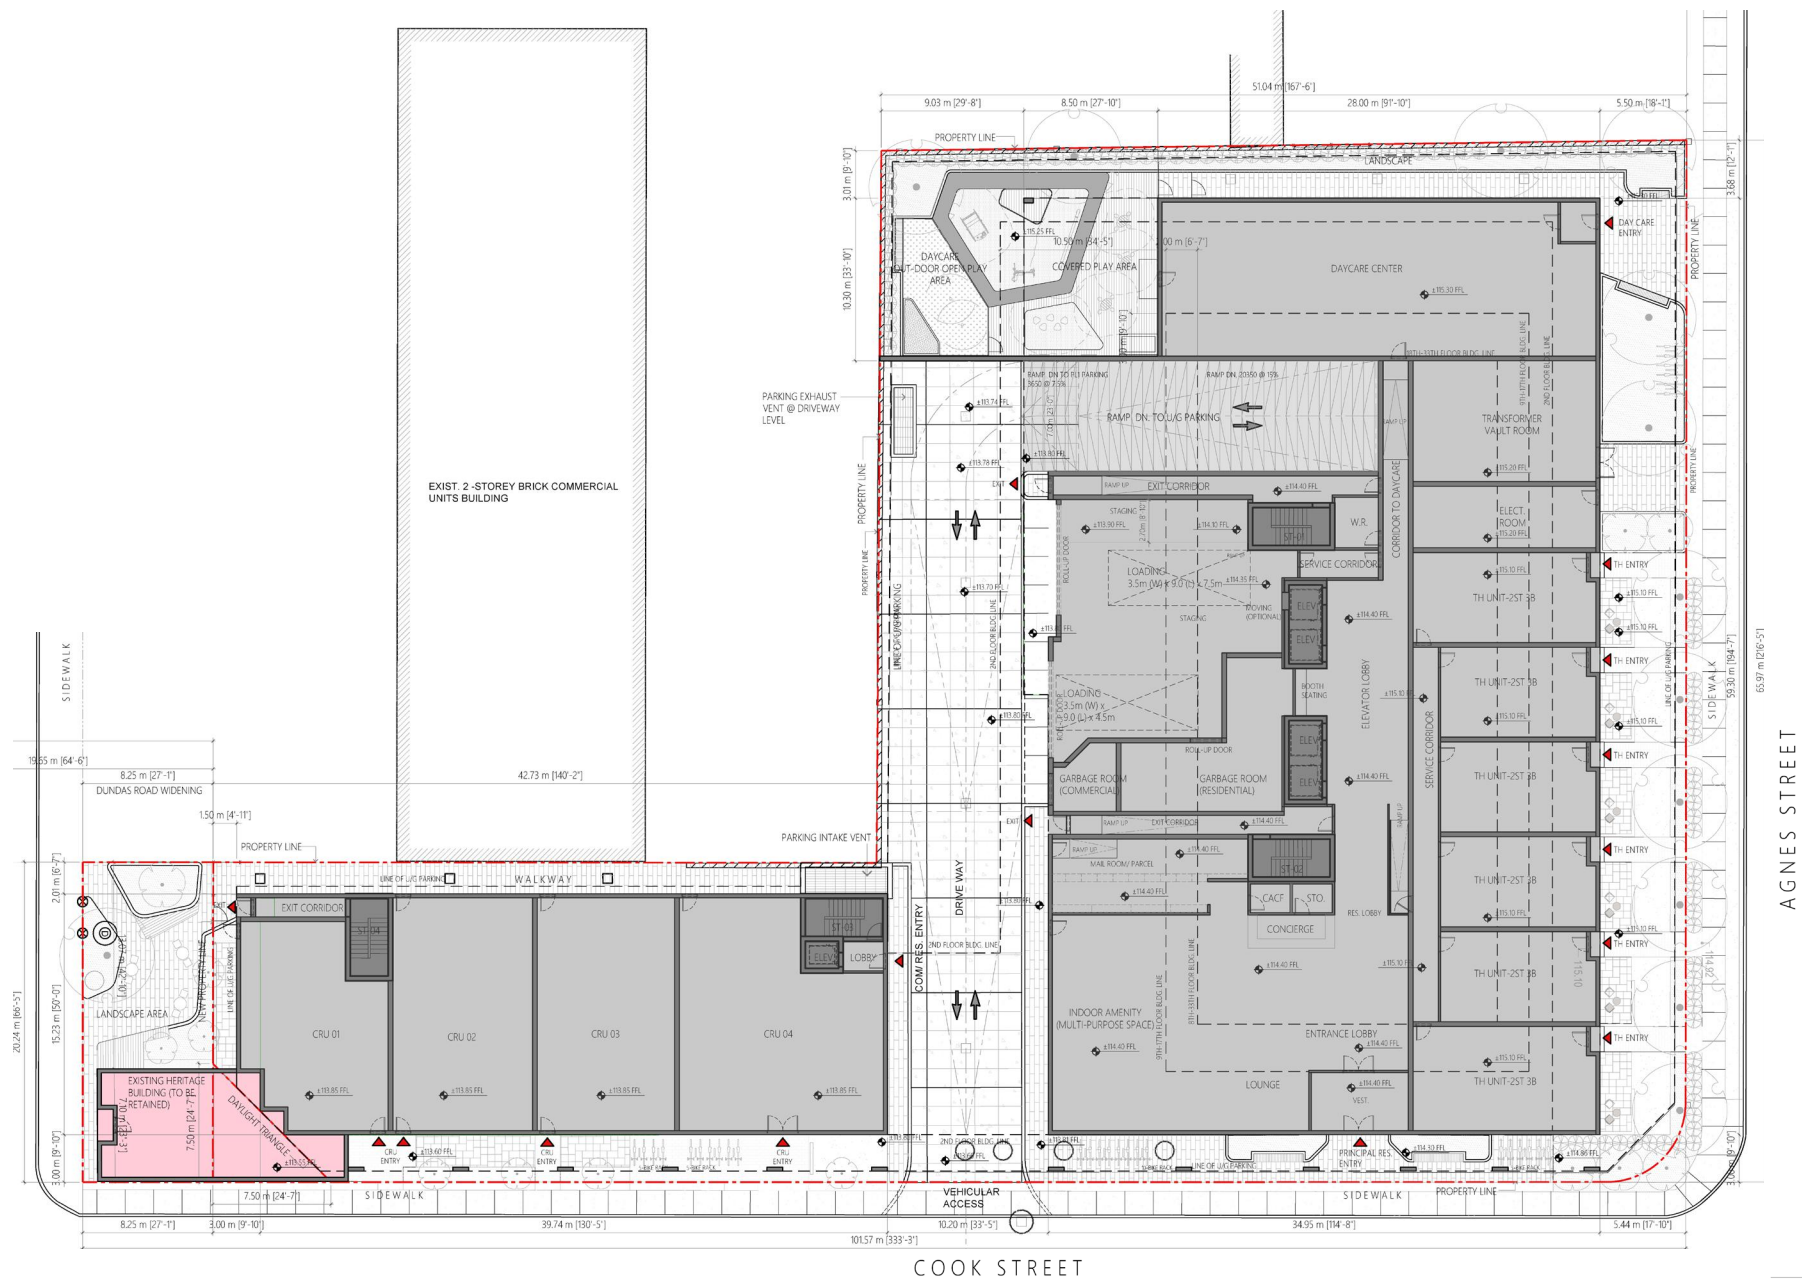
Ground Floor Plan (Source: Lumbao Architects)
